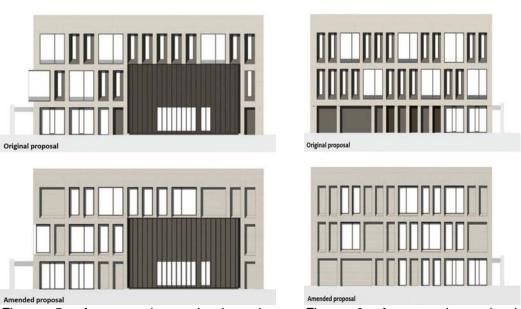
A comparison showing the southwest elevation, the windows within which face towards the Brook Drive properties, in its originally-proposed format (top) and amended format (bottom)
